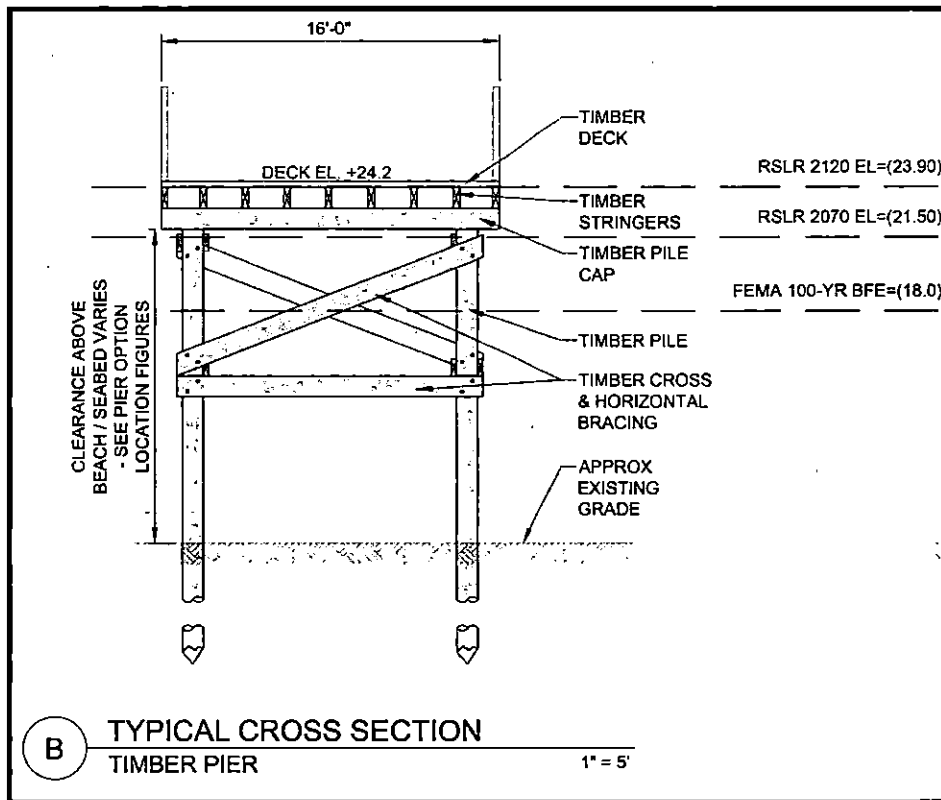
Proposed Timber Pier Conceptual Cross Section
